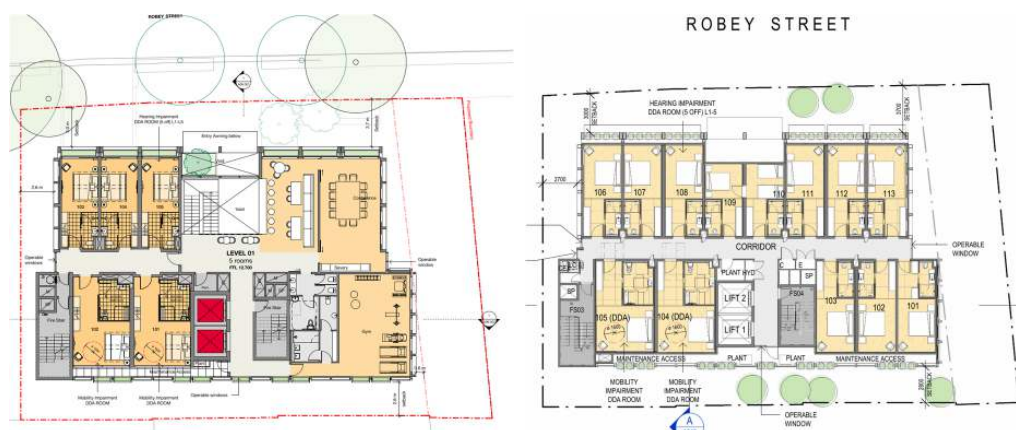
Previously approved level 1 (left) and proposed level 1 with all hotel rooms (right)
